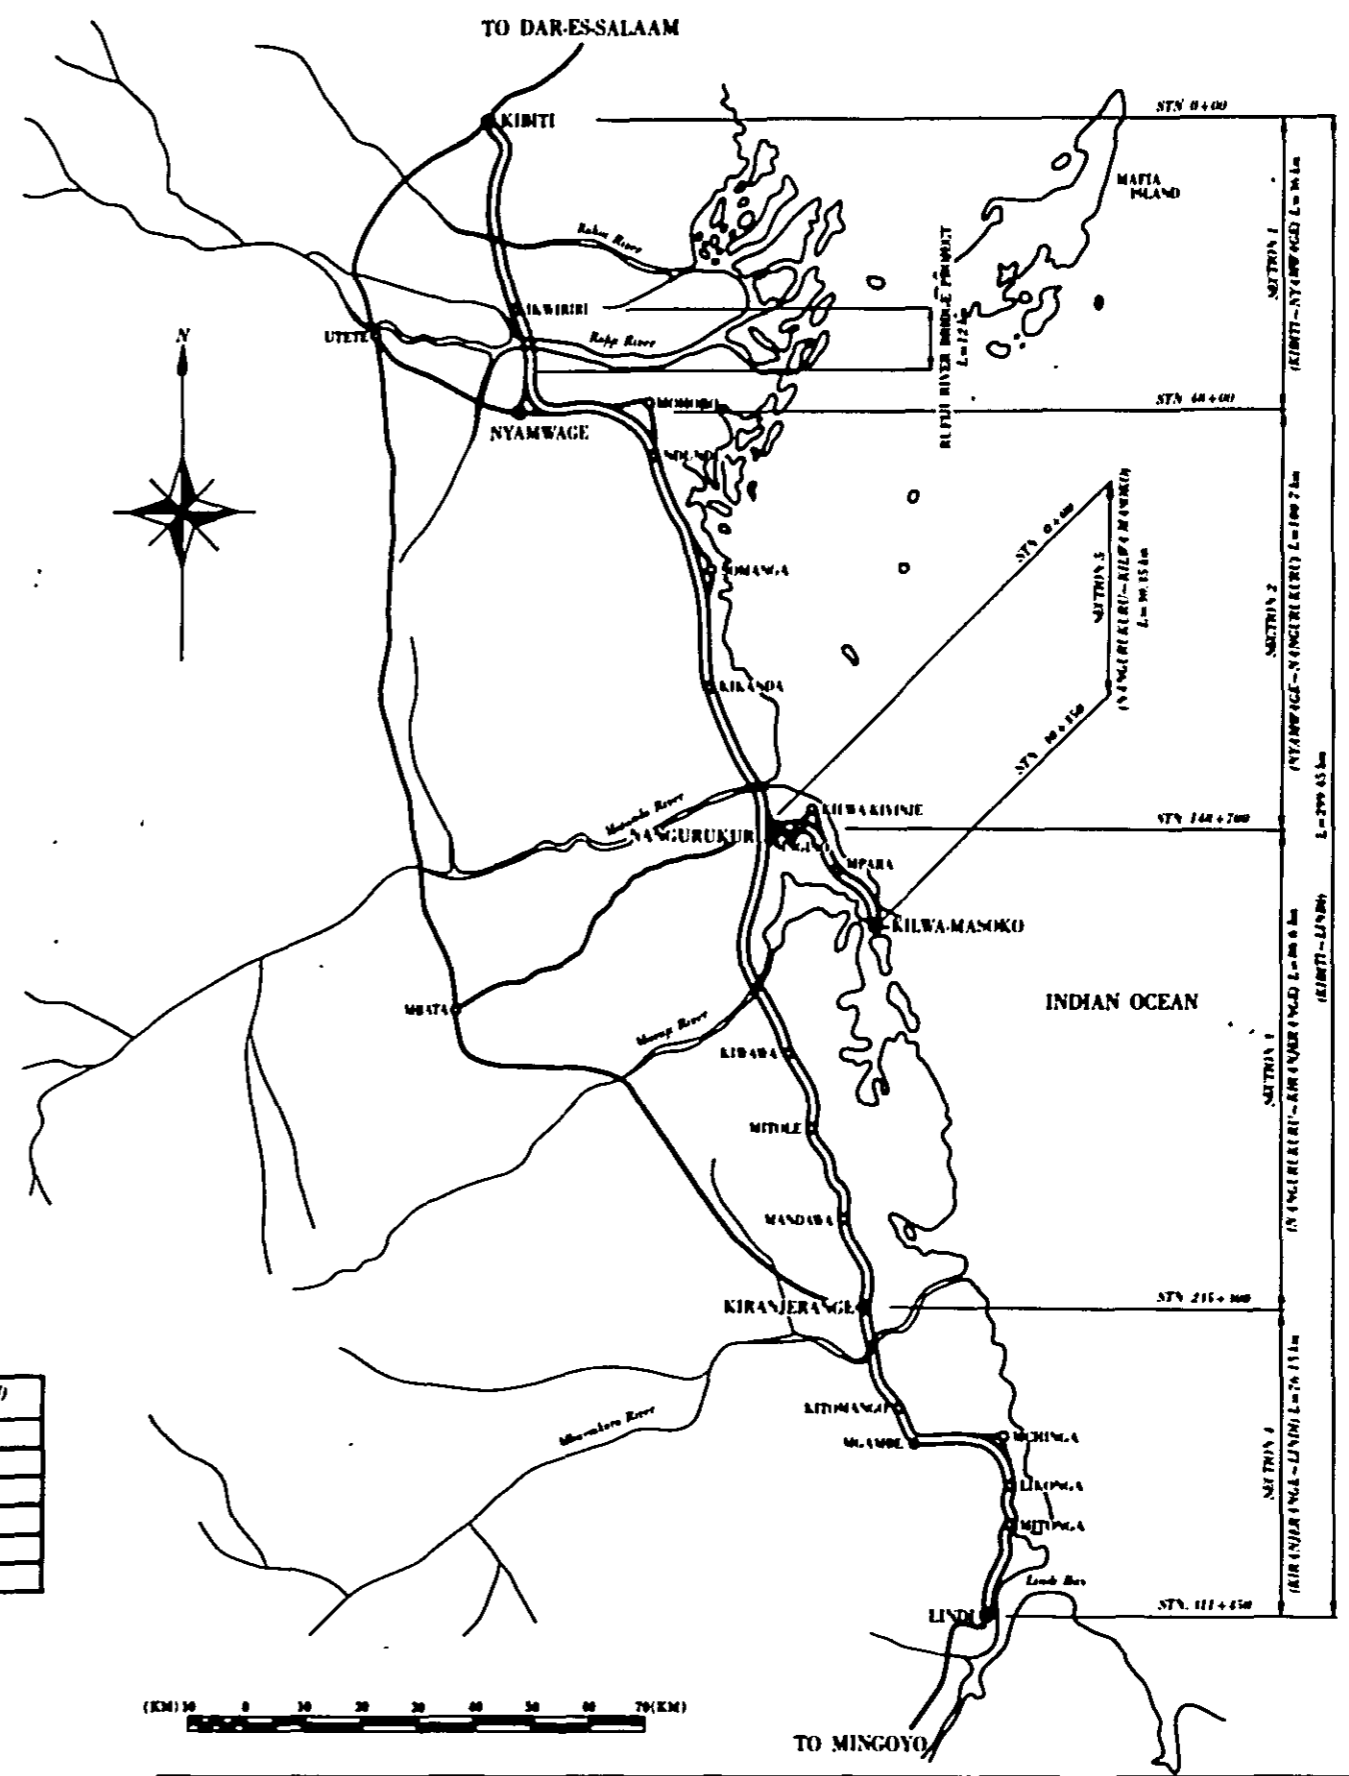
SOUTHERN COASTAL LINK ROAD PROJECT LOCATION PLAN
